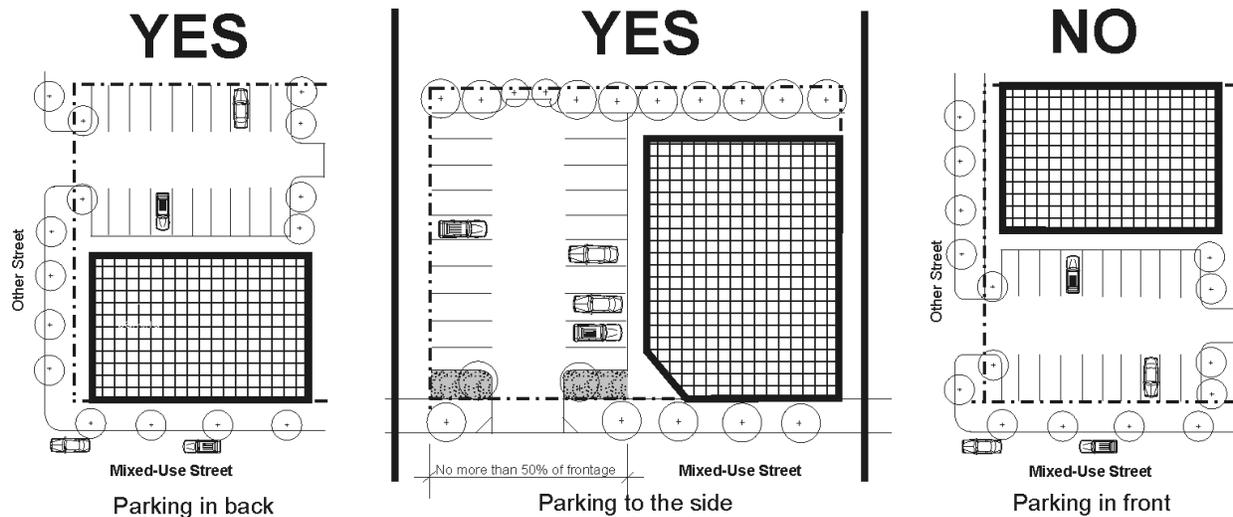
B.30.100i. Acceptable and unacceptable parking lot configurations along mixed-use streets. Note that in the middle example, plantings between parking area and sidewalk should allow for visibility so that a driver and pedestrian can see one another and avoid a collision.
